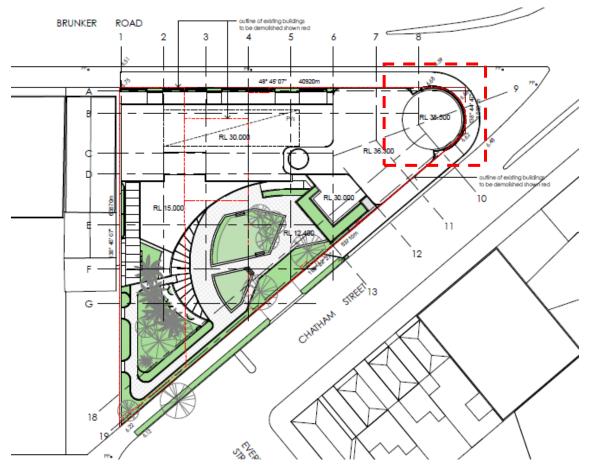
Component of the building with proposed height of 30.1m height (Source: JSA Studio Architects)
